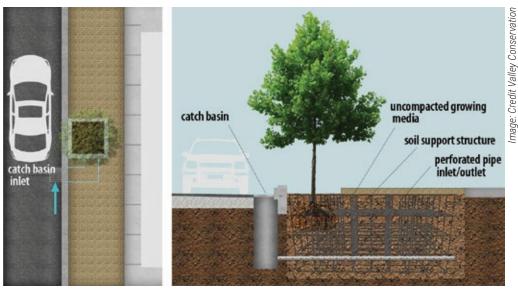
Cross section of tree box with a structural support system under the sidewalk.
